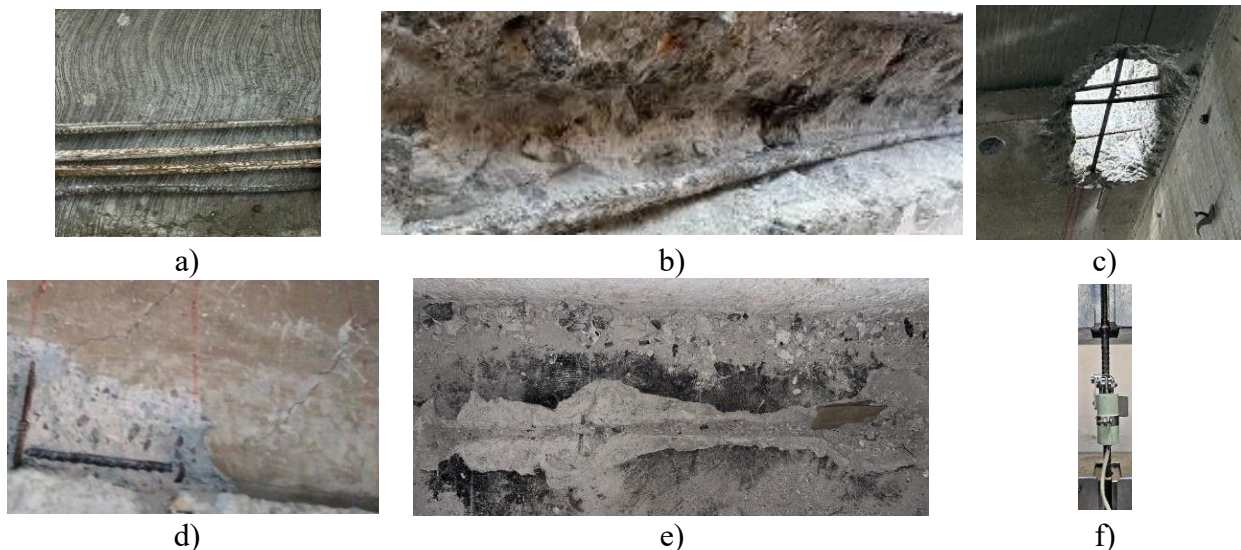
Extraction of reinforcing steel test specimens; a) steel test specimens; b) in secondary beam; c) in lower part of slab; d) in main beam; e) in upper part of slab; f) Tinius LoCap universal testing machine.
